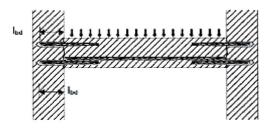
End anchoring of slabs or beams, designed as simply supported
